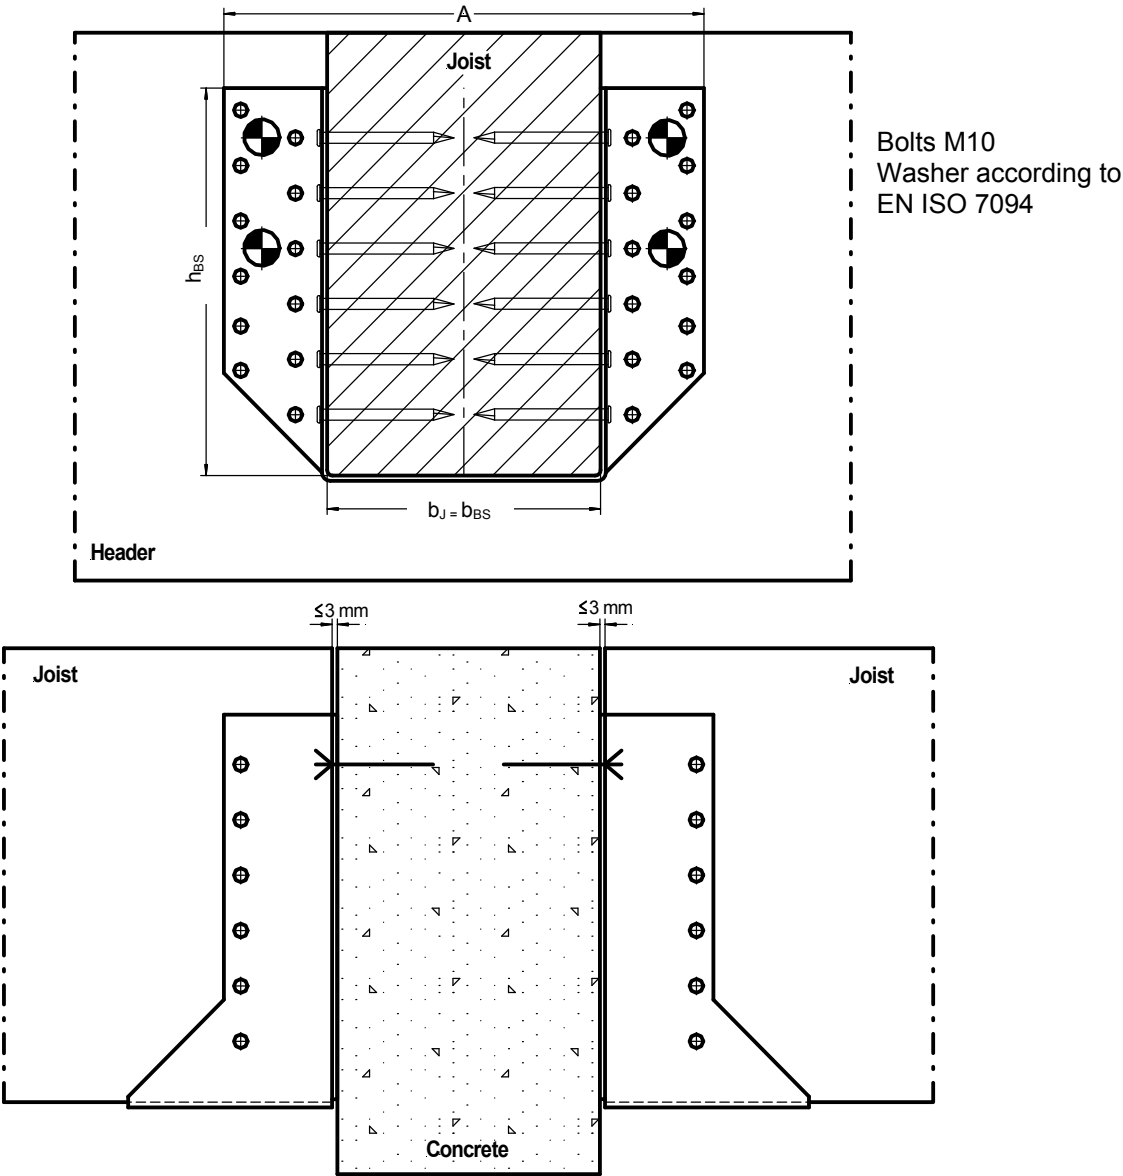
BB joist hanger connected to concrete, lightweight concrete or steel members by bolts
